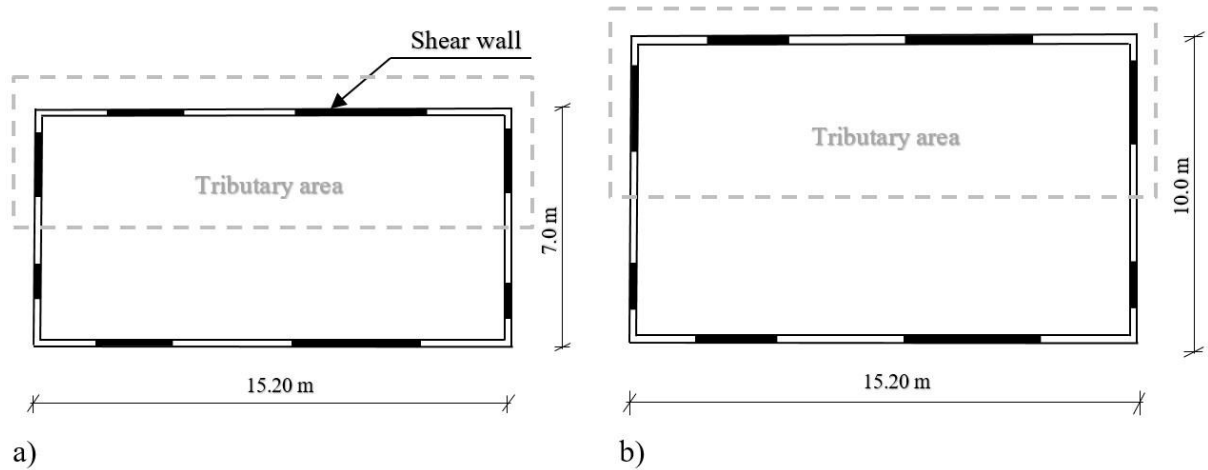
Typical plan views of the archetypes: a) residential and b) office buildings.
